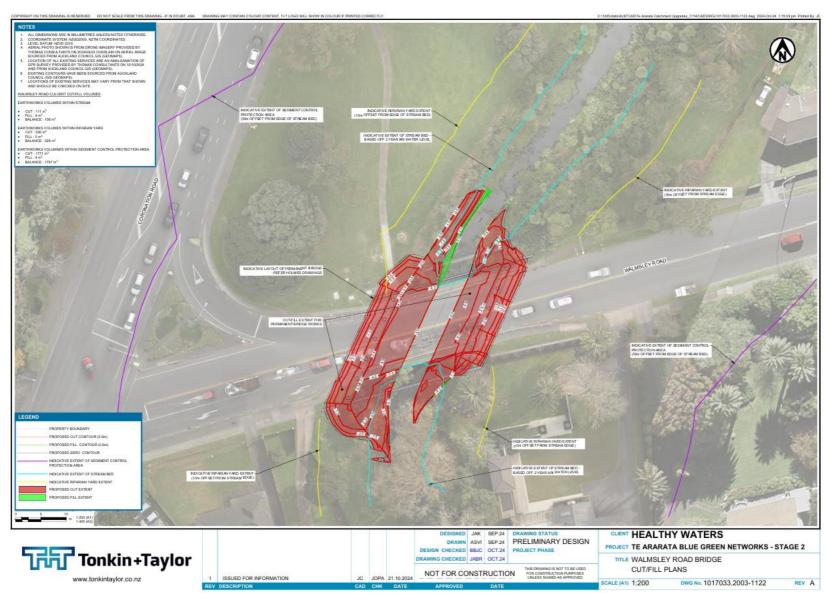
Walmsley Road Bridge - Cut/Fill Plans
